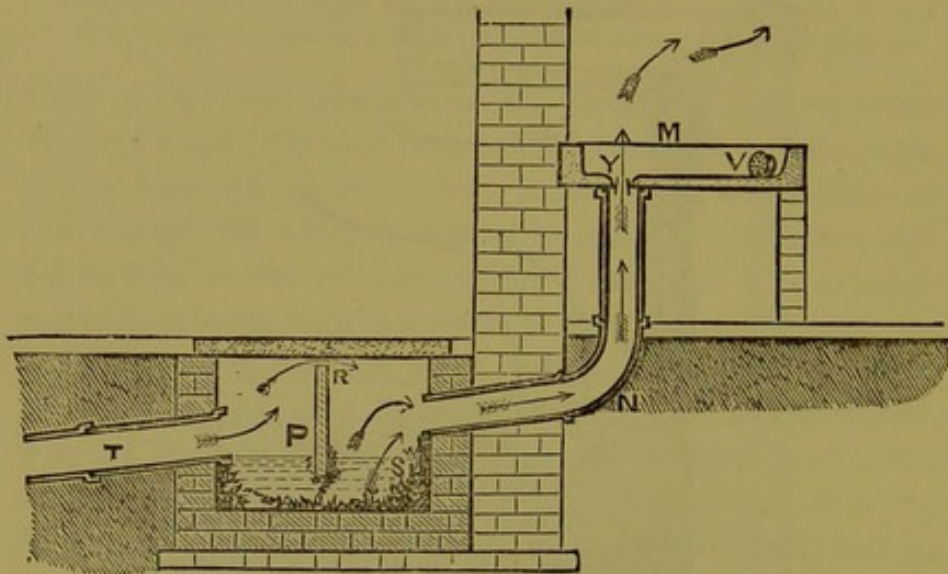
Section of Sink, and Brick Grease-trap : bad arrangement.
